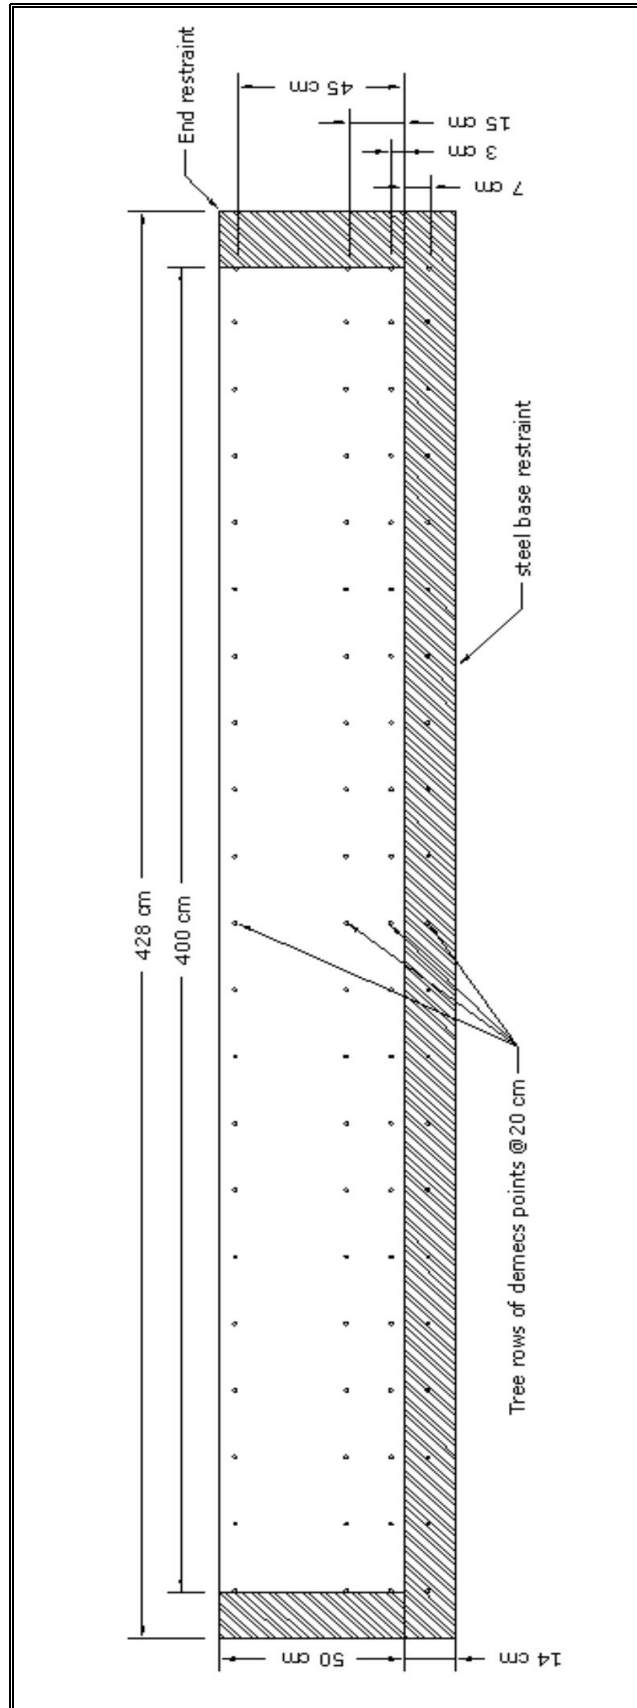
Fixing of demecs on wall (8w) and (8S)
